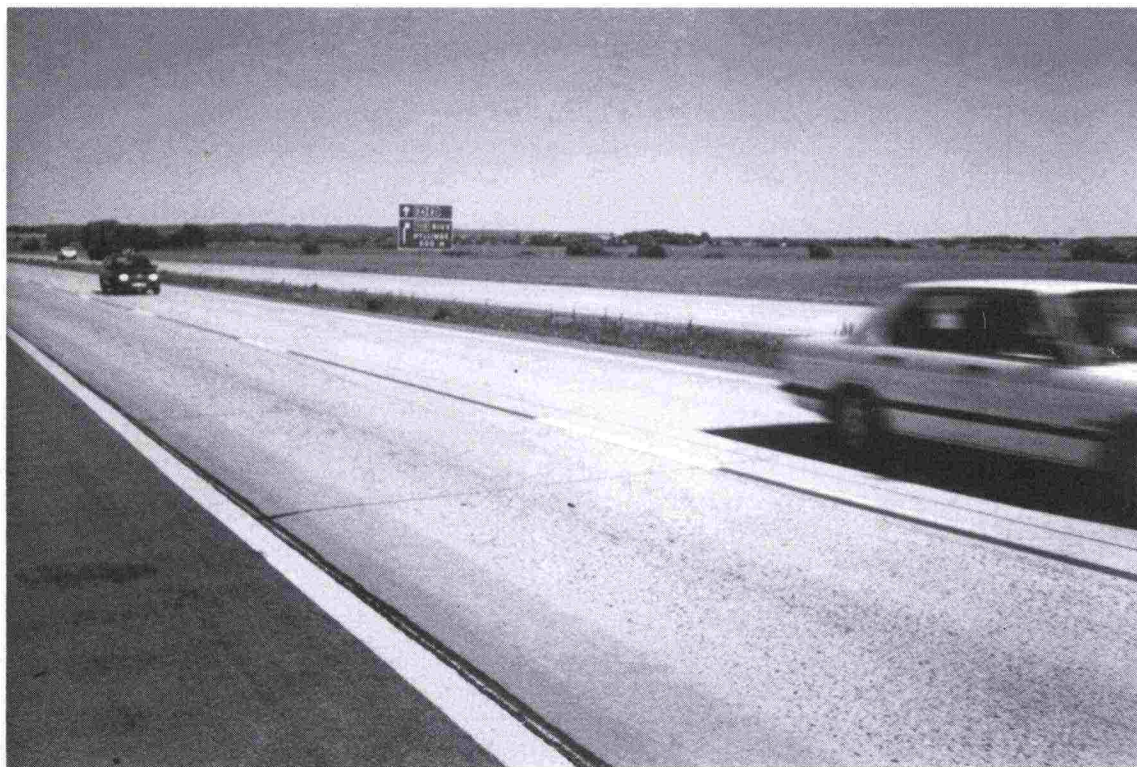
Concrete pavement on the road section Väla-Hyllinge, E4, Helsingborg built in 1978. Tests to move driving lines are being made in summer 1988.
